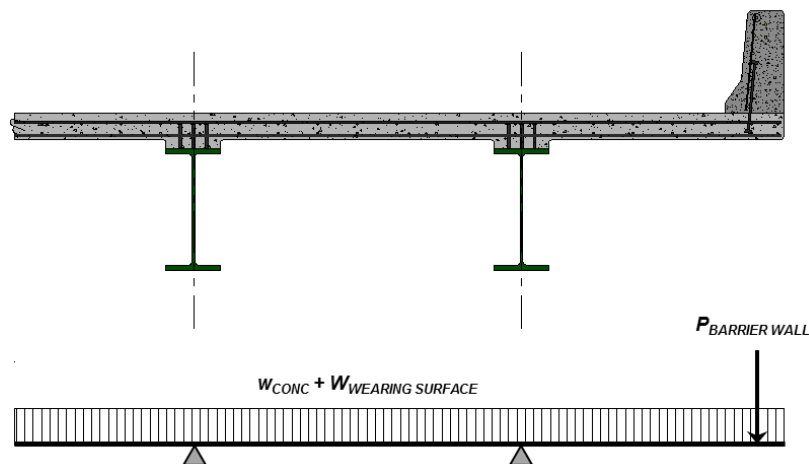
Idealization of dead loads for a typical bridge deck cantilever slab overhang
